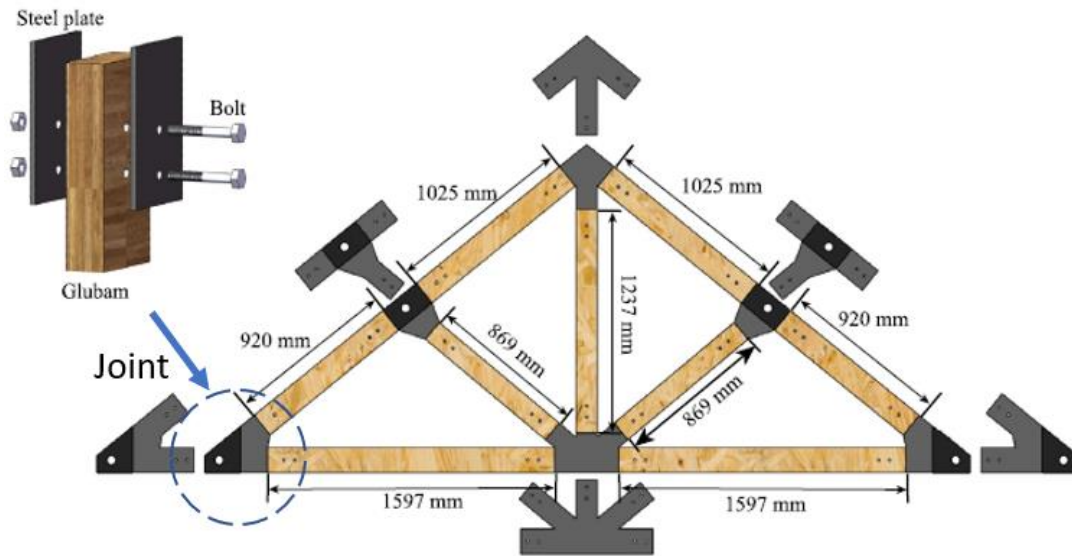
Geometrical Dimensions of the Steel Side-Clamped-plate Glubam Roof Truss
